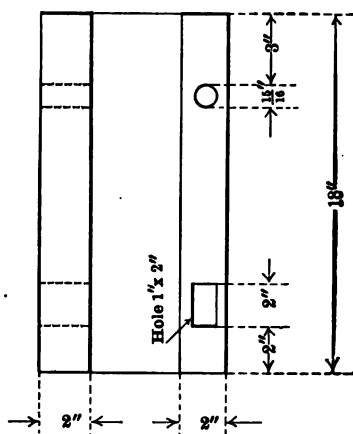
Form of Specimen for Longitudinal Shear Test of Wood
